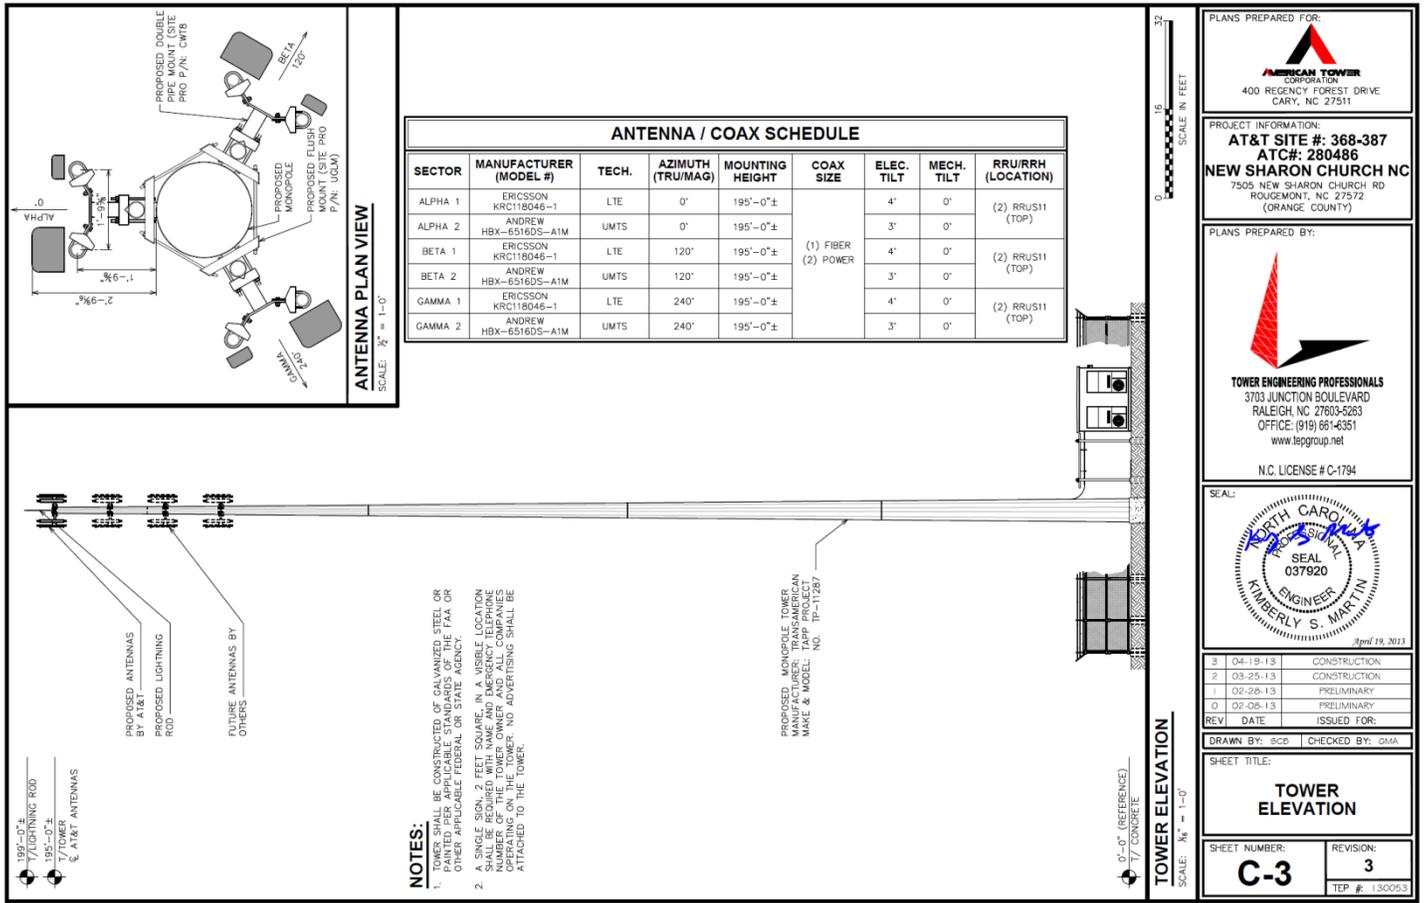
Tower elevation diagram for New Sharon Church Rd. site
